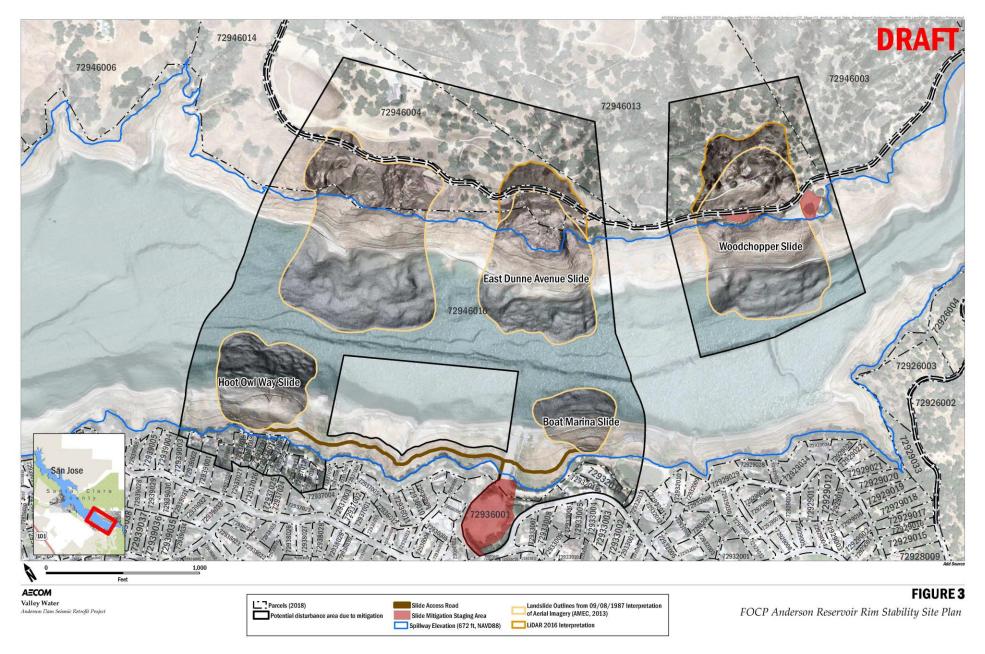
FOCP Anderson Reservoir Rim Stability Site Plan
